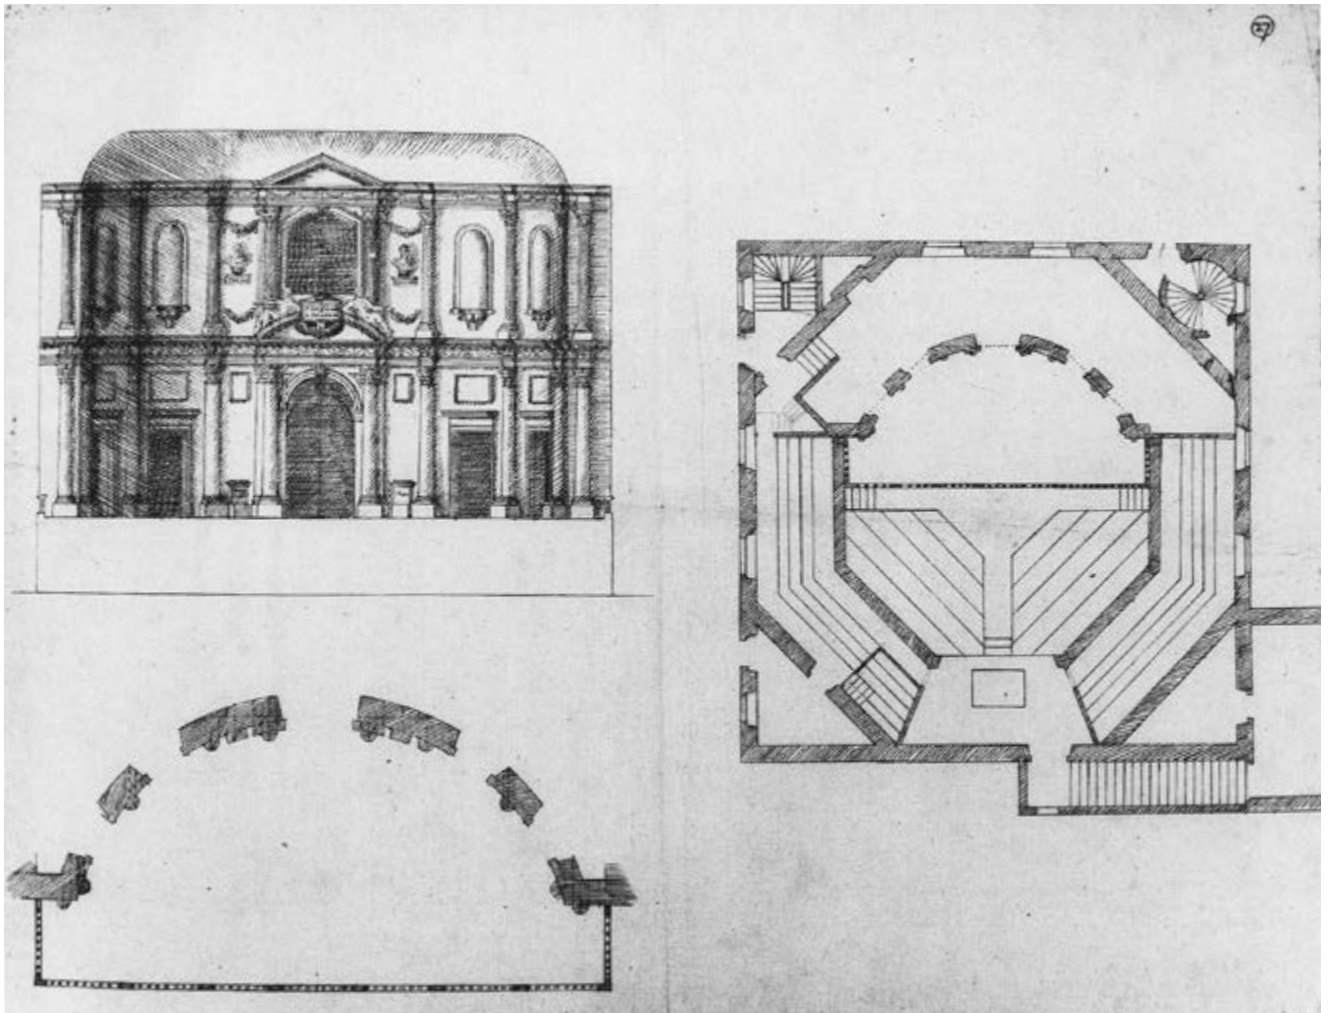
John Webb. Plan and elevation of the stage of the Cockpit Theatre at Whitehall Palace, 1660
